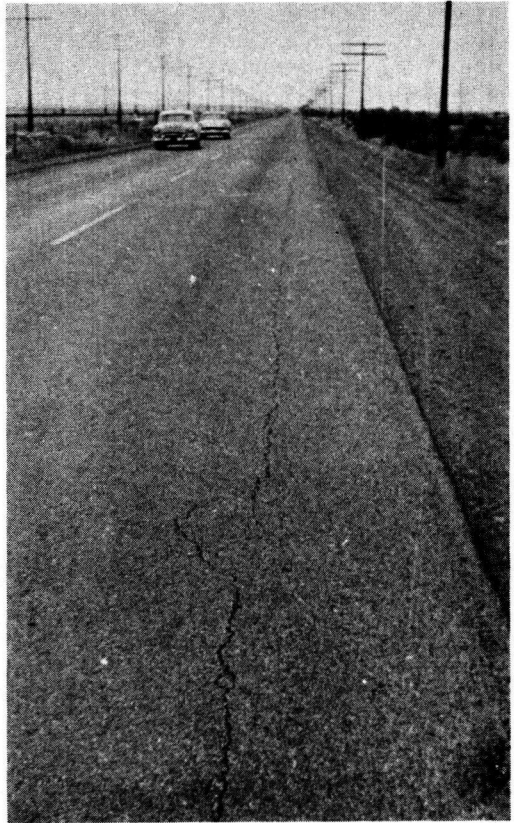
Longitudinal crack over old asphaltic concrete pavement edge.
